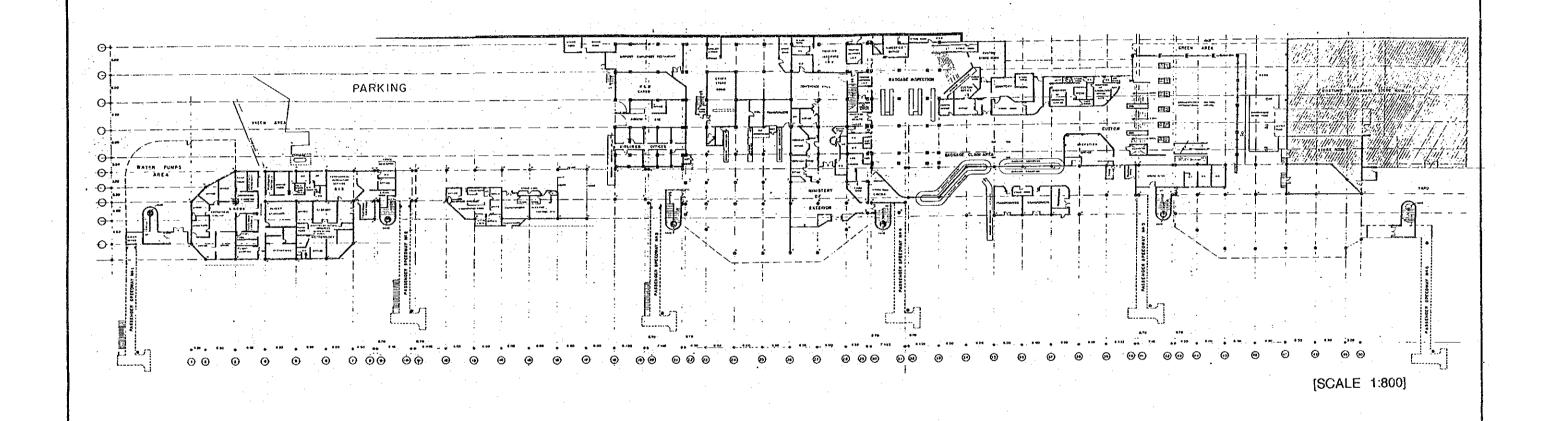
Existing Floor Plan of International Passenger Terminal Building (Basement Floor)
